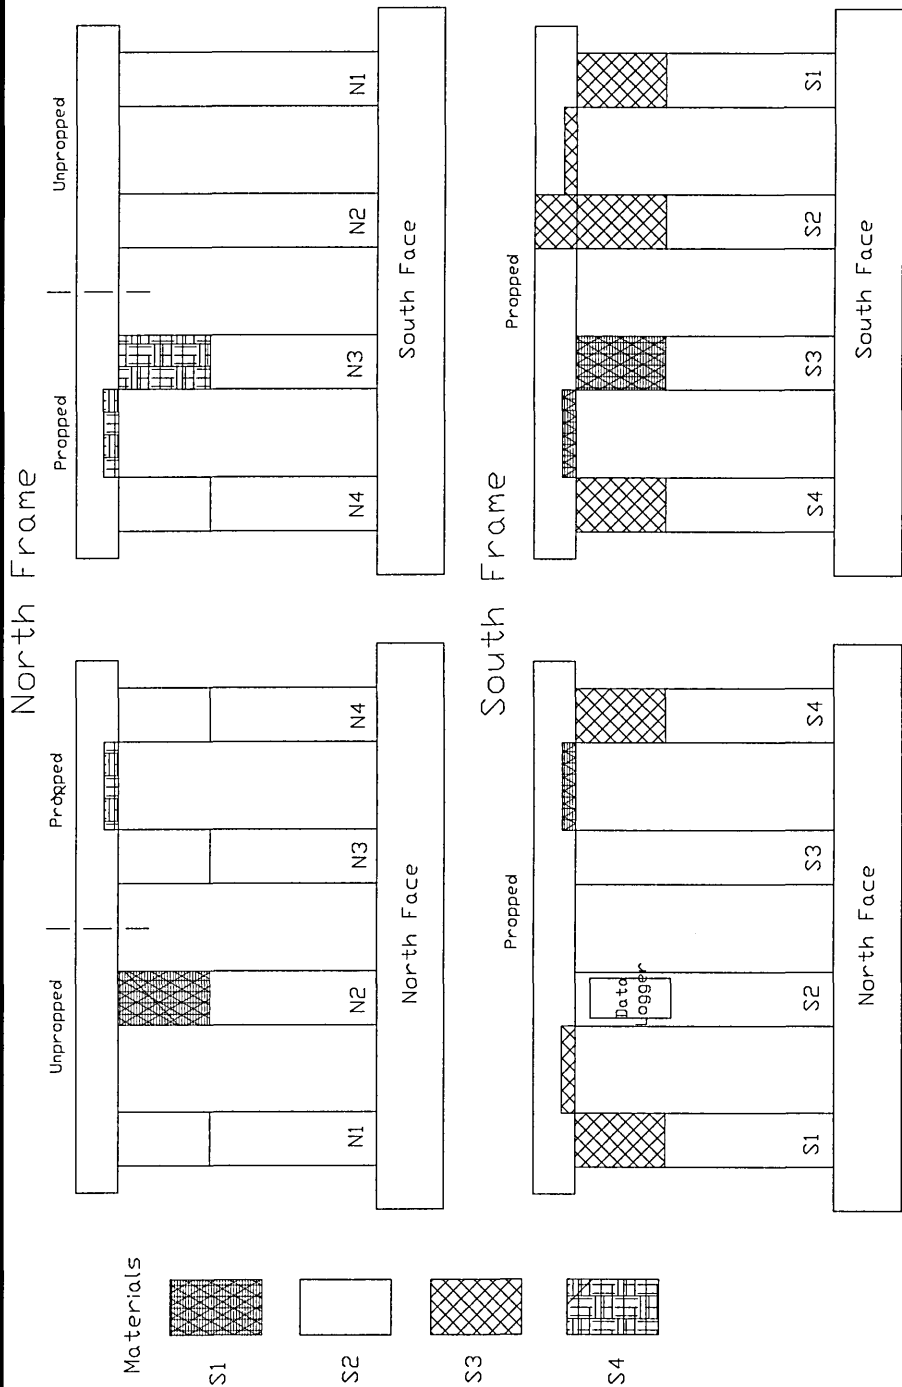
Sections of Sutherland Street Bridge showing the column and beam support system and positions of repair patches
